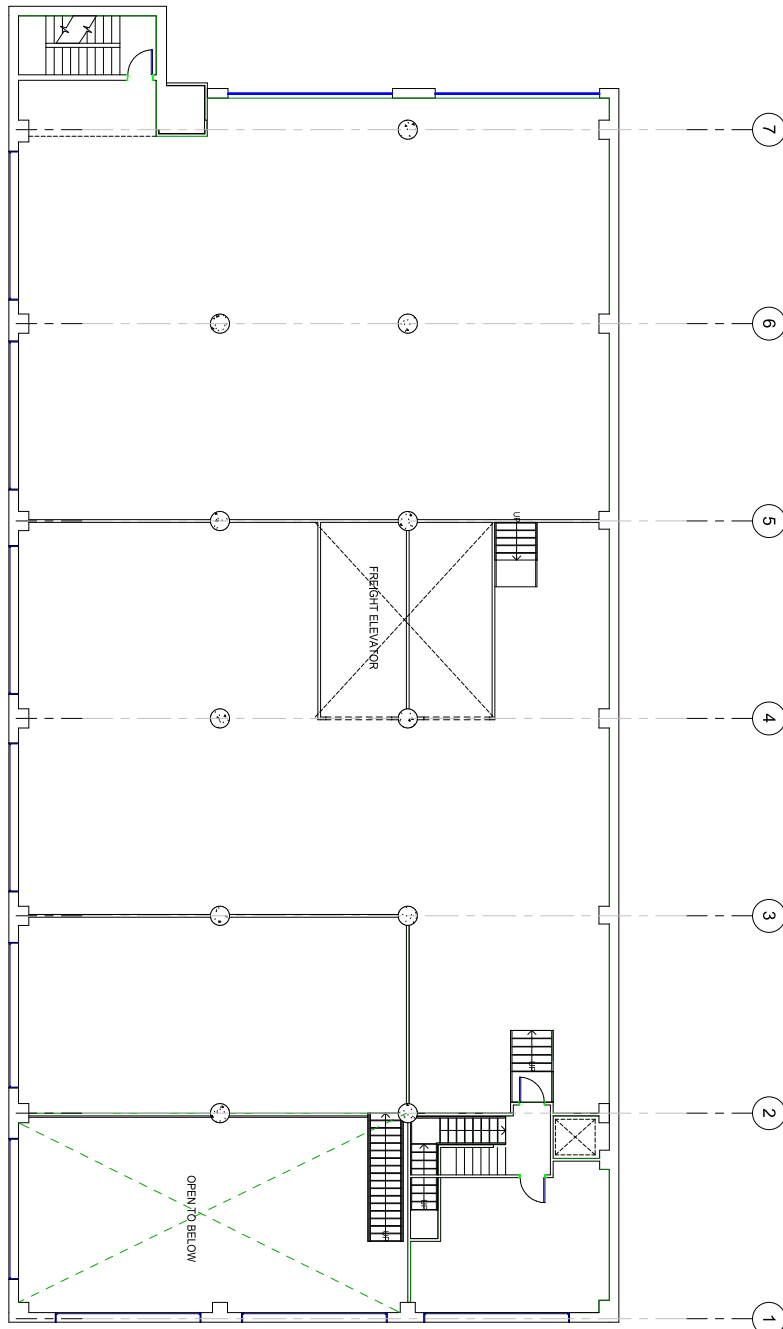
As-Built Second Floor Plan. (WILDESIGN Architects, 2018)
